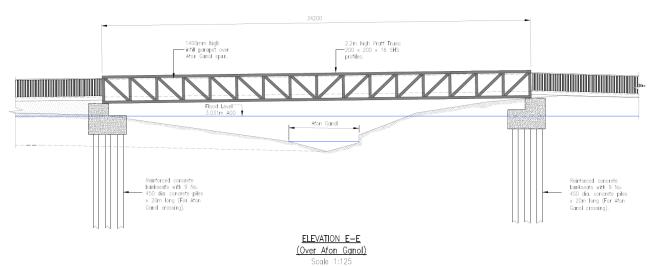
Footpath and cycleway bridge over the Afon Ganol (Bridge 1)
